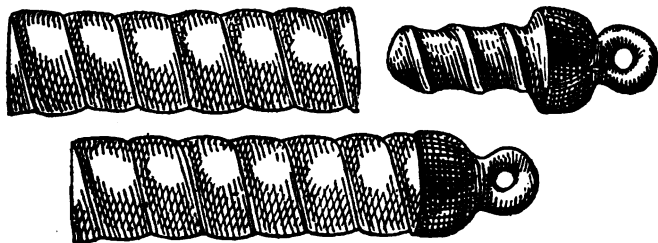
and 7.129.—Greenfield flexible steel conduit; fig. 7.128 single strip type; fig. 7.129 double strip type. The former (fig. 7.128) is formed with a single strip of galvanized steel, interlocked and gasketed in such a manner as to be suitable for concrete construction. The double strip type (fig. 7.129) is constructed of a concave and convex steel strip, spirally wound upon each other in such a manner as to interlock their concave surfaces. Thus the convex surfaces of the two strips form respectively the outer and inner surfaces of the conduit. This construction insures a smooth interior surface, thus reducing the possibility of friction in the drawing in of conductors. A gasket is provided between the inner and outer strips rendering the conduit moisture proof. This form of flexible conduit is especially adapted to use where the wiring is installed after completion of building, because it is very flexible.
